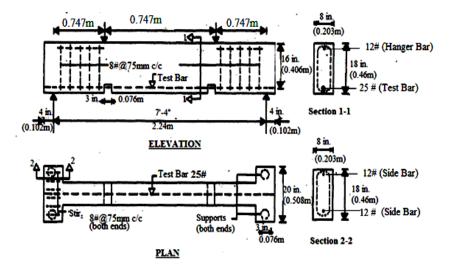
Reinforcement details of NBS beam specimen (Paul 1978)
